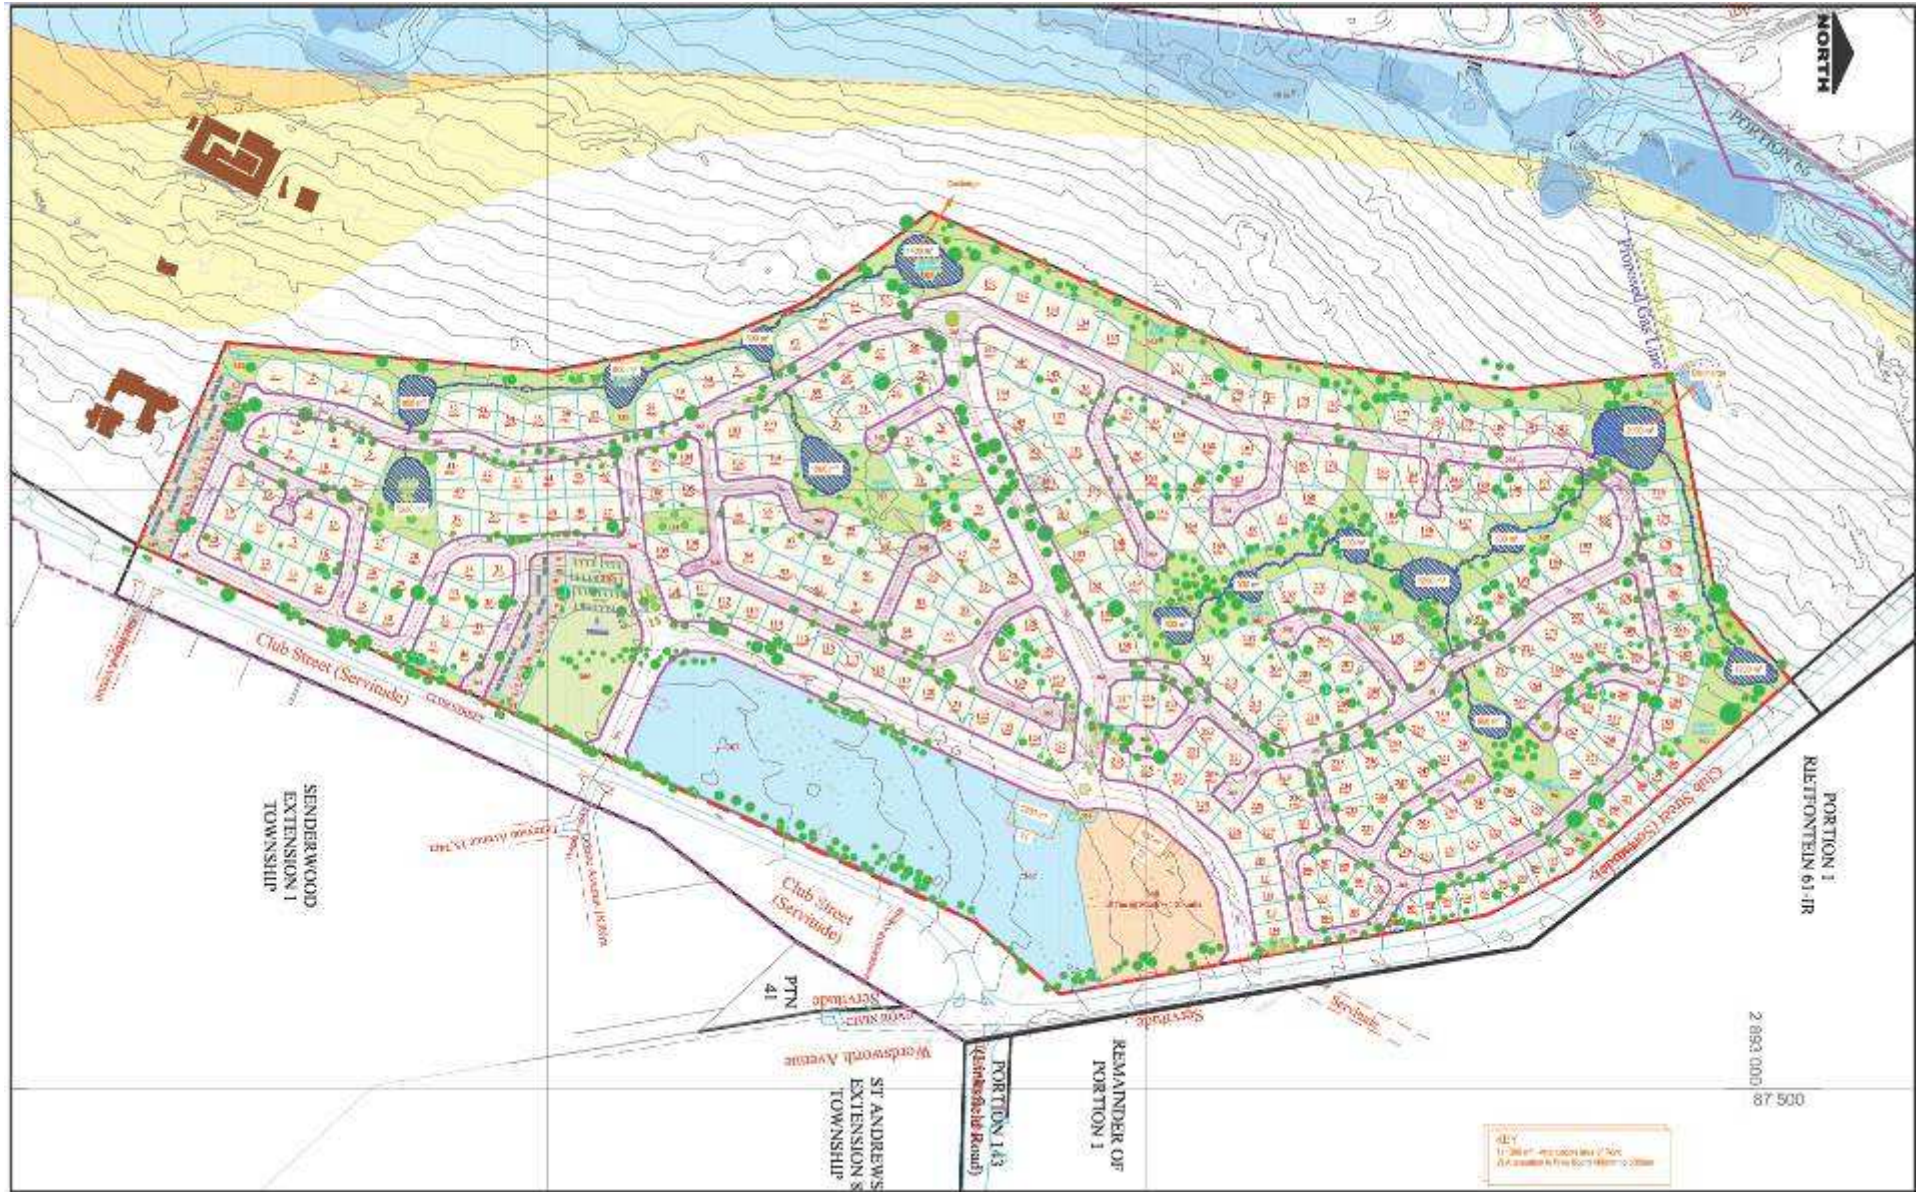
Stormwater Attenuation Pond Layout within the proposed Huddle Township Development
